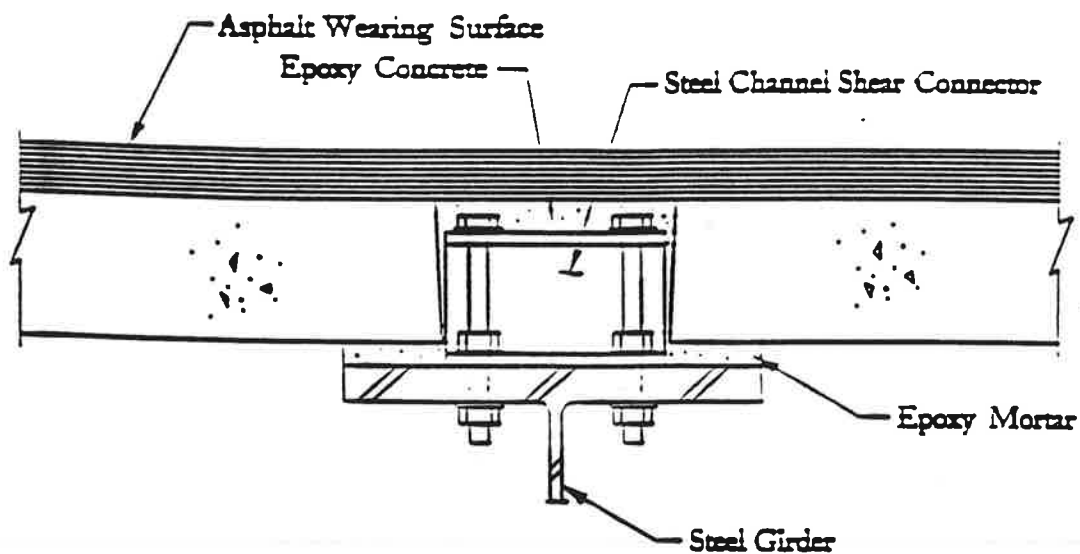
Suggested Details for Steel Girder Deck Design for New Girder Deck.
